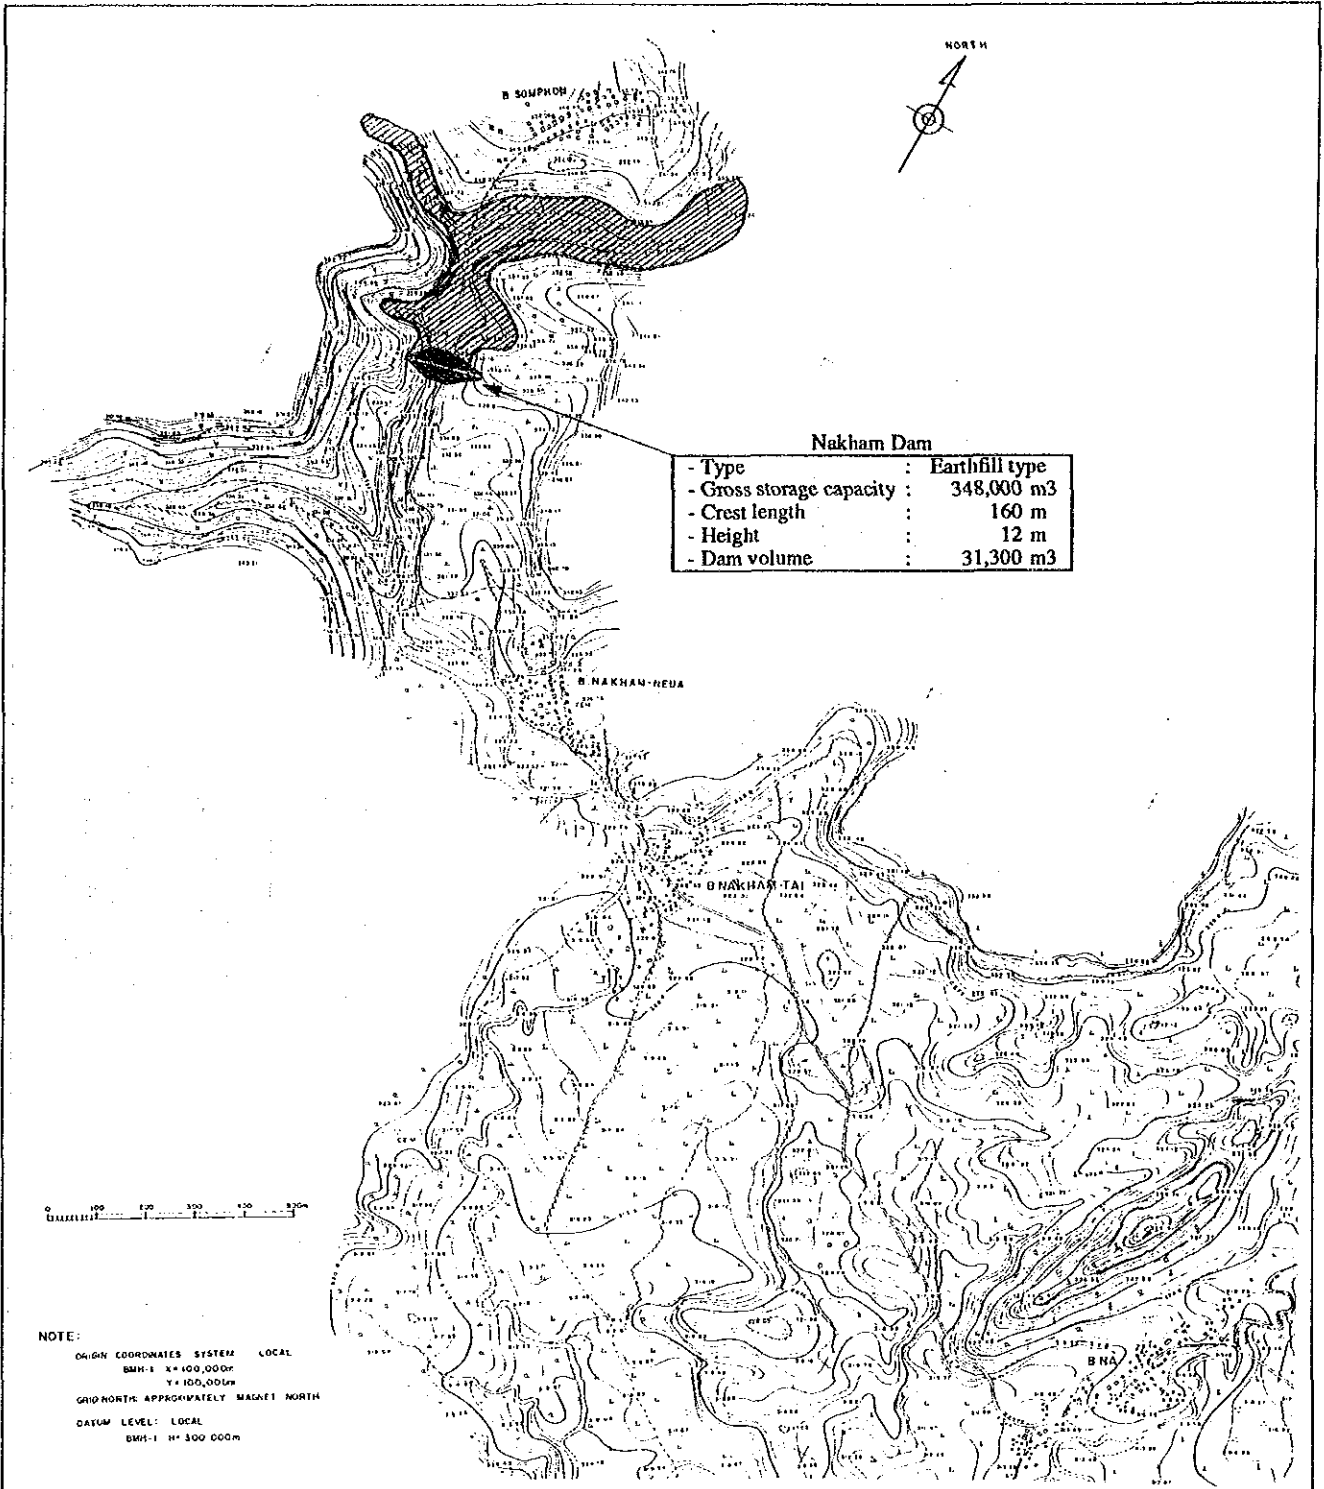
Nakham Dam Plan of Hun Model Area
